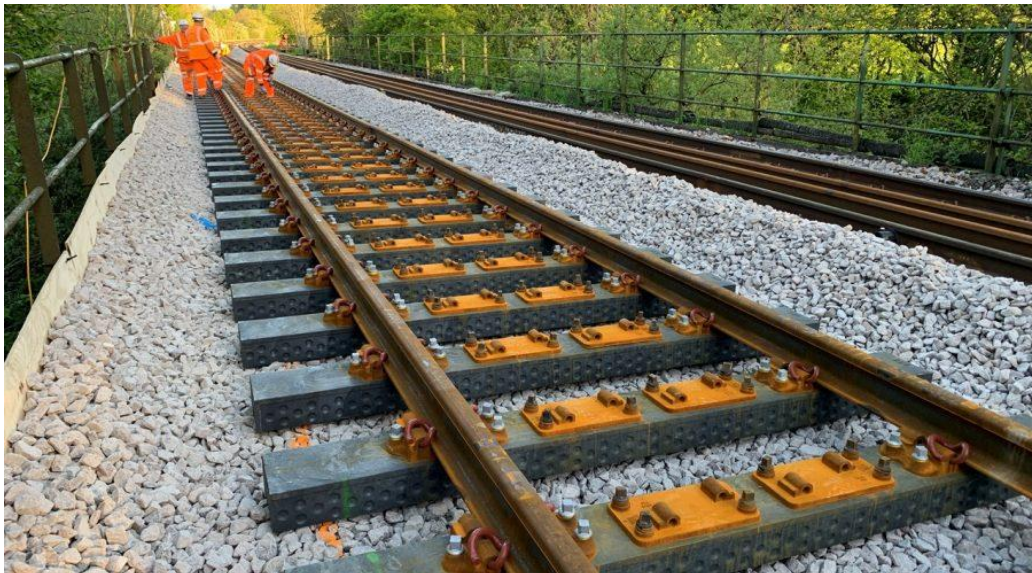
Beyond wood - first recycled plastic railway sleepers laid on Network Rail tracks⁴⁶
